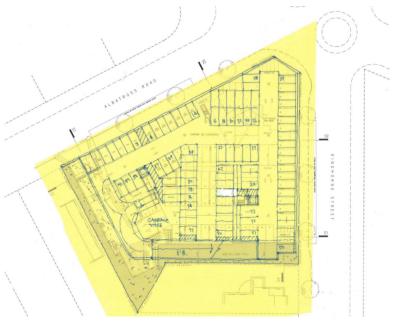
Applicant's submitted concept plan, demonstrating that access via Kinghorne Street is capable of being achieved.
